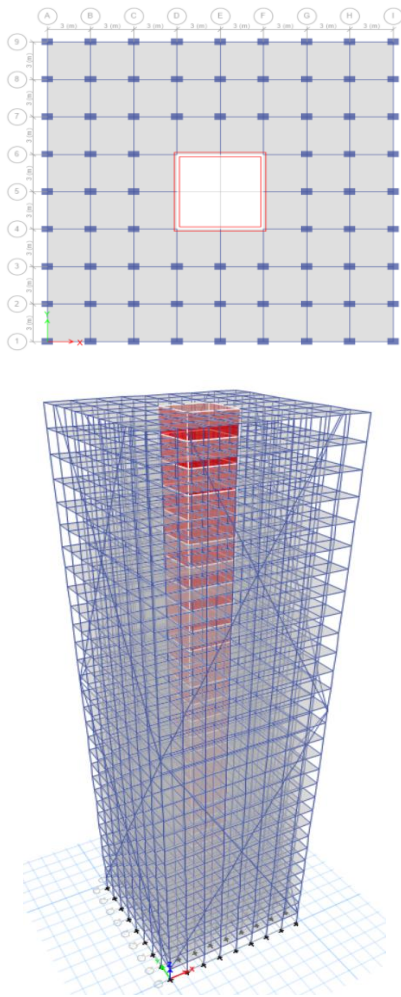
Plan and 3D Model of Trussed Tube Frame Building (Bracing-63°)
